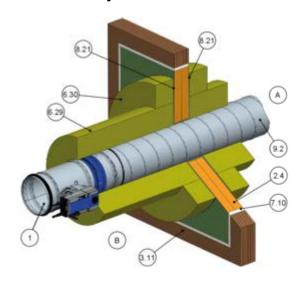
Installation remote from solid wood or cross-laminated timber walls with mineral wool
